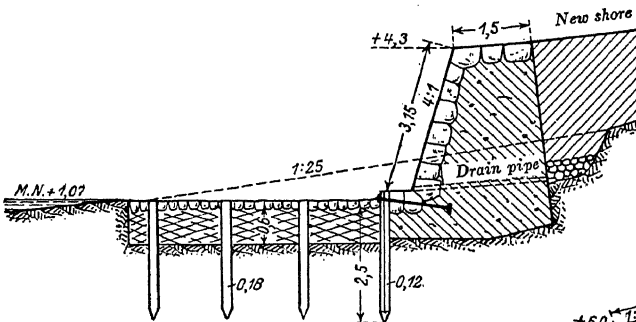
Shore protection suitable for stable strand having soft intermediate layers
